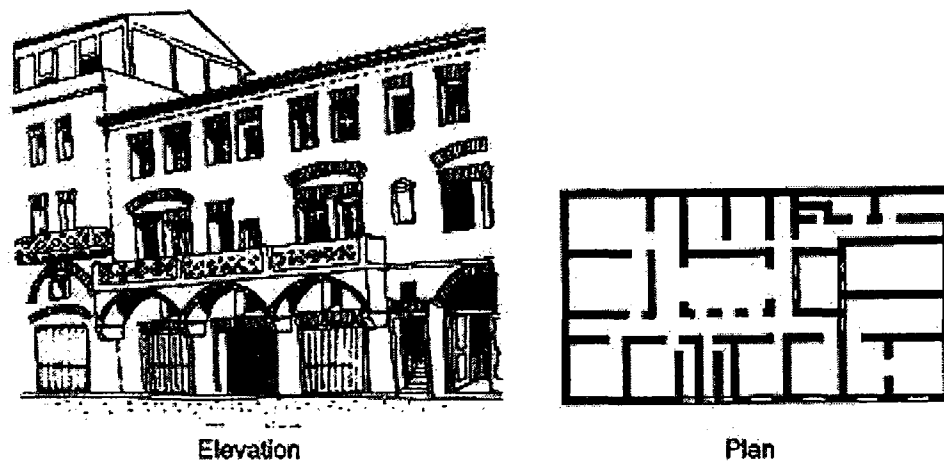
Early multistory load-bearing masonry structure (Drysdale and Hamid, 2005)
